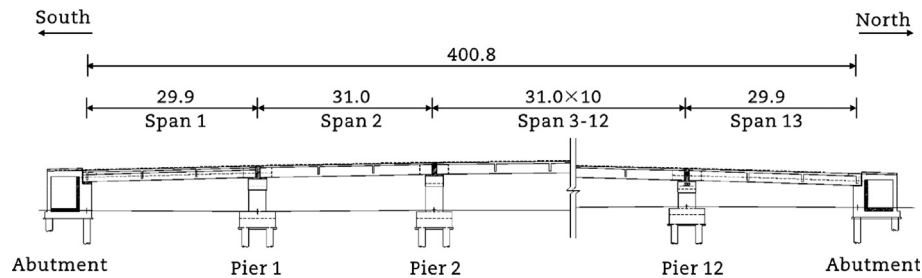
Elevation layout of Isola della Scala Bridge (m).
